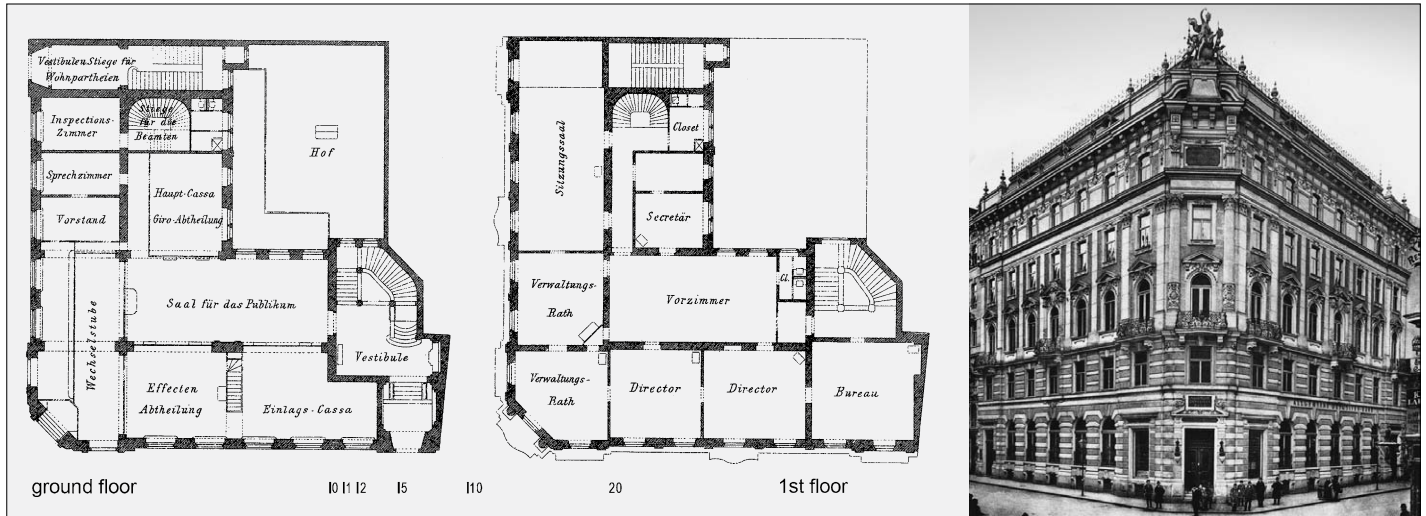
THE GROUND FLOOR AND FIRST FLOOR PLANS AND THE EXTERIOR VIEW OF THE ALLGEMEINE DEPOSITENBANK BUILDING, SCHOTTENGASSE 1 / TEINFALTSTRASSE IN VIENNA, 1892-1894, ARCHITECT EMIL FÖRSTER
